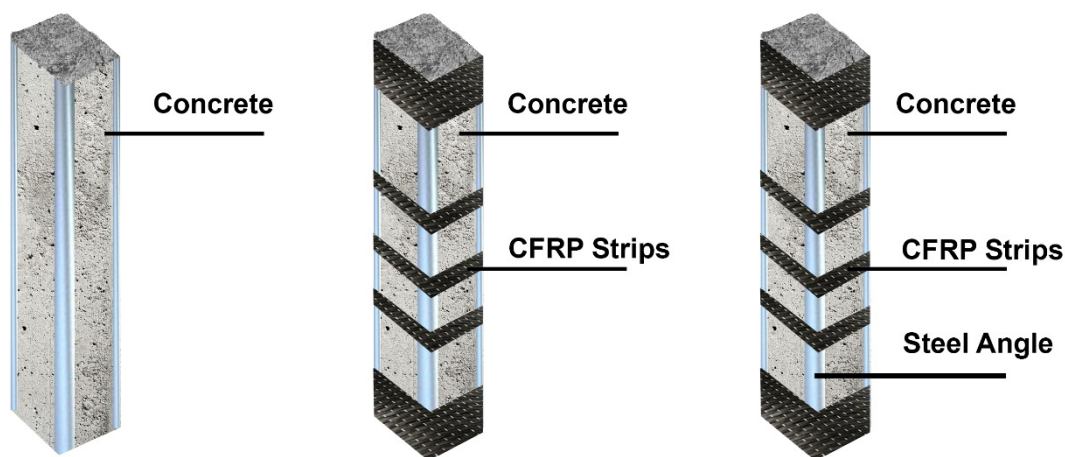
Stages of connecting CFRP strips to concrete for strength enhancement.
